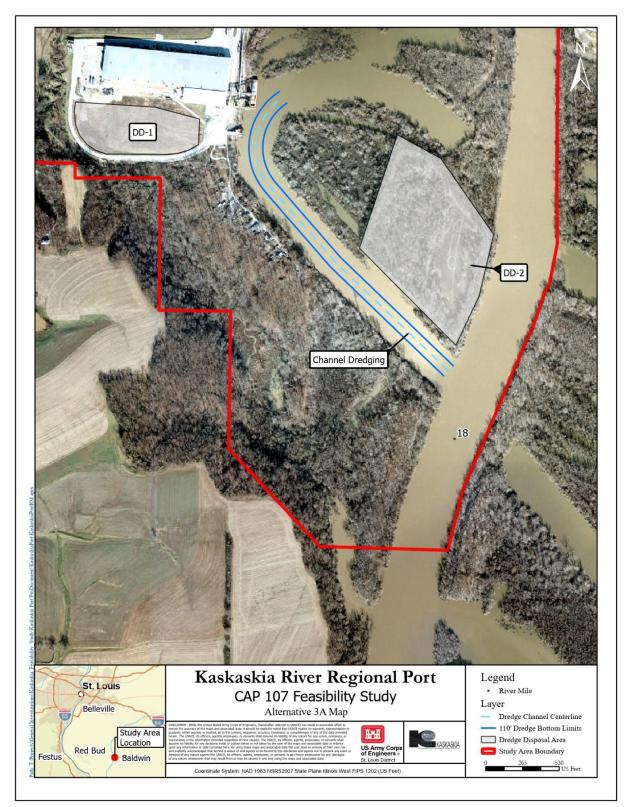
Alternative 3a – Minimum (Two-Way Traffic)
